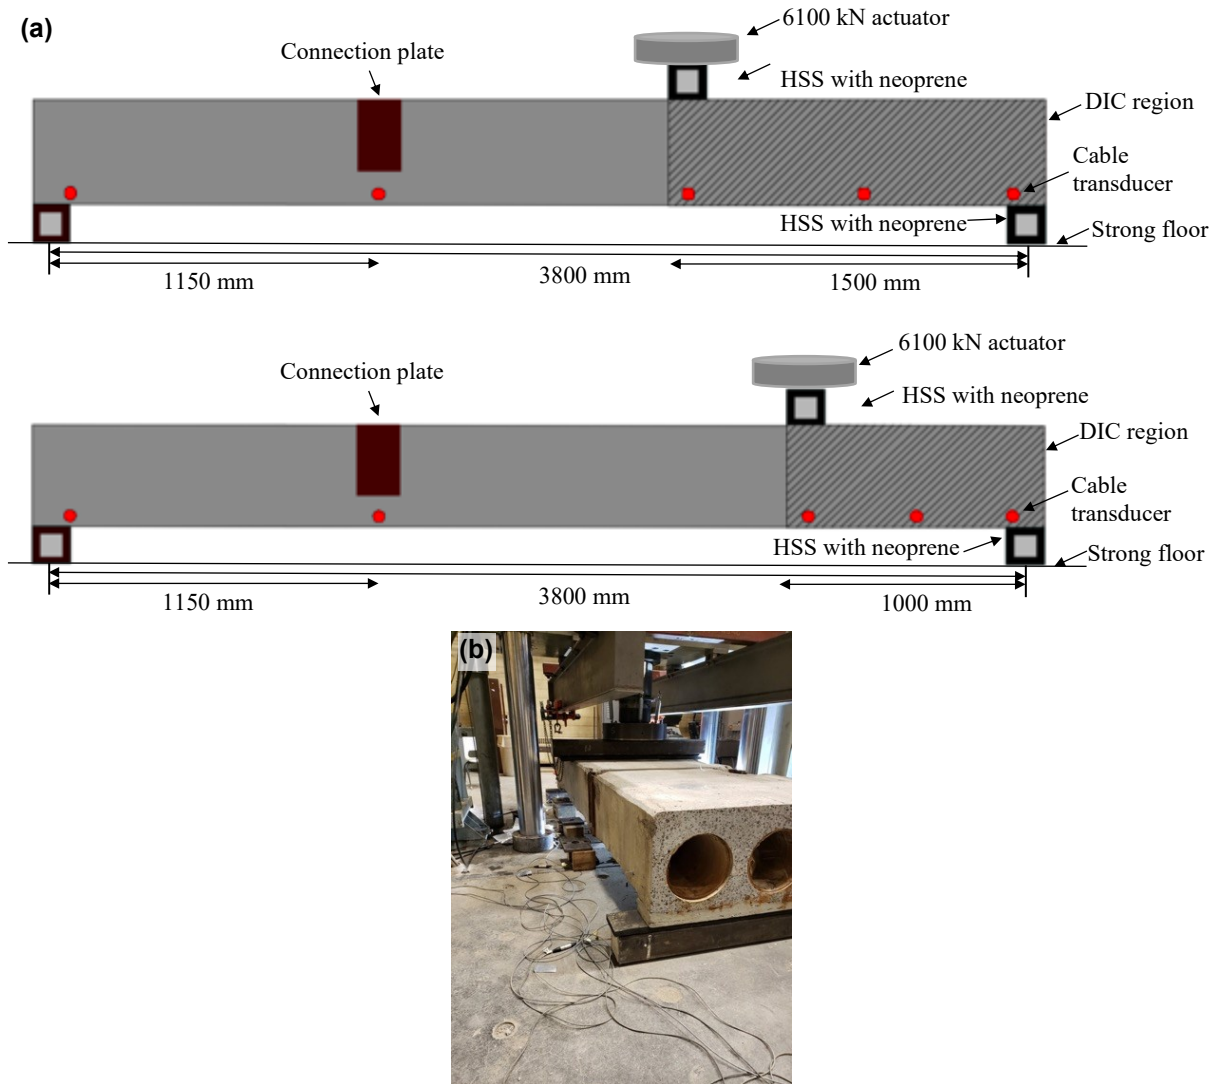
17: Test setup and instrumentation (a) Elevation view of test setup showing location of load points and instrumentation (b) Photo of test specimen.
